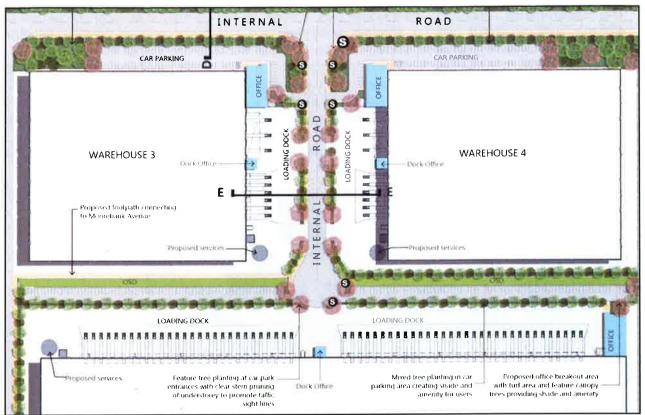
Typical proposed landscaping (Source: Applicant's RtS)
